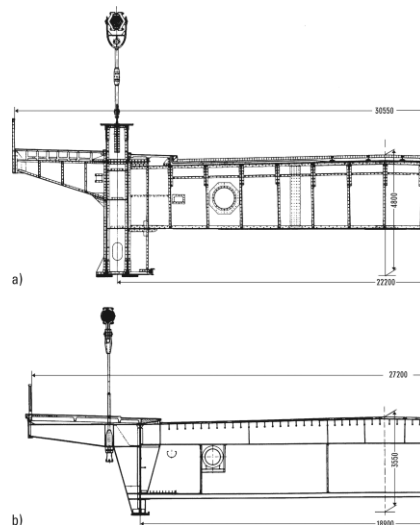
Suspension road bridge over the river: Rhine, between Köln-Mülheim, with supporting distances 85.0 + 315.0 + 85.0 m; Sections: old (a) and new (b) bridge
